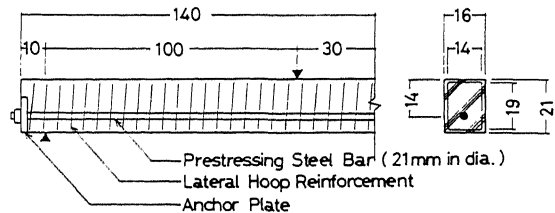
Scheme of test specimen and loading condition (unit : cm)
